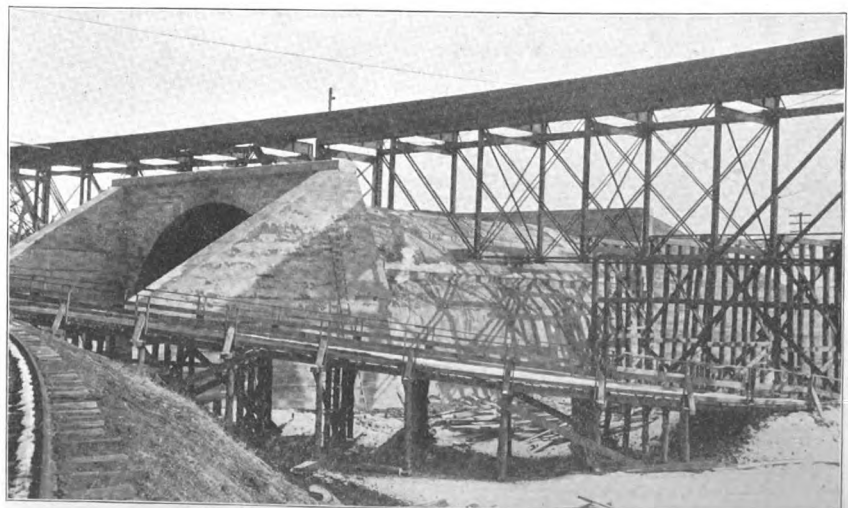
VIEW SHOWING HOW BARREL OF 60 FT. ARCH WAS BUILT AROUND MEMBERS OF TRUSS BRIDGE.
